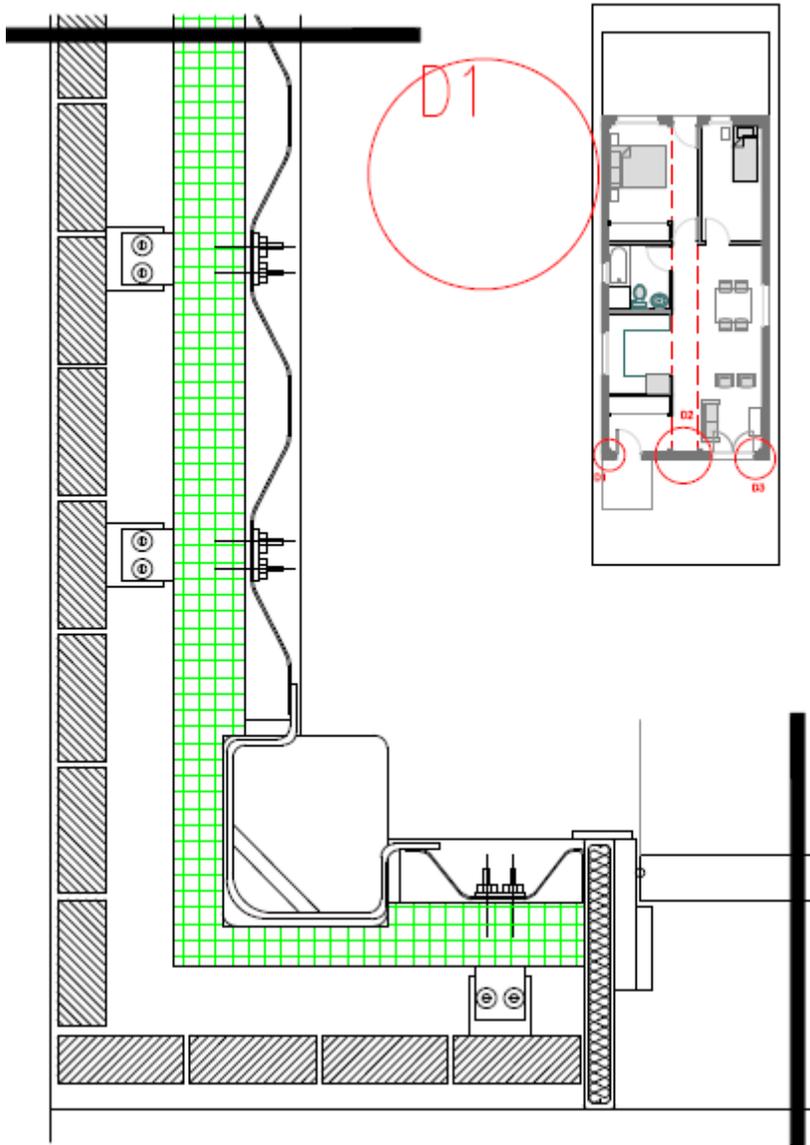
Aerial layout highlighting the fastened brick and insulation on the shipping container.
